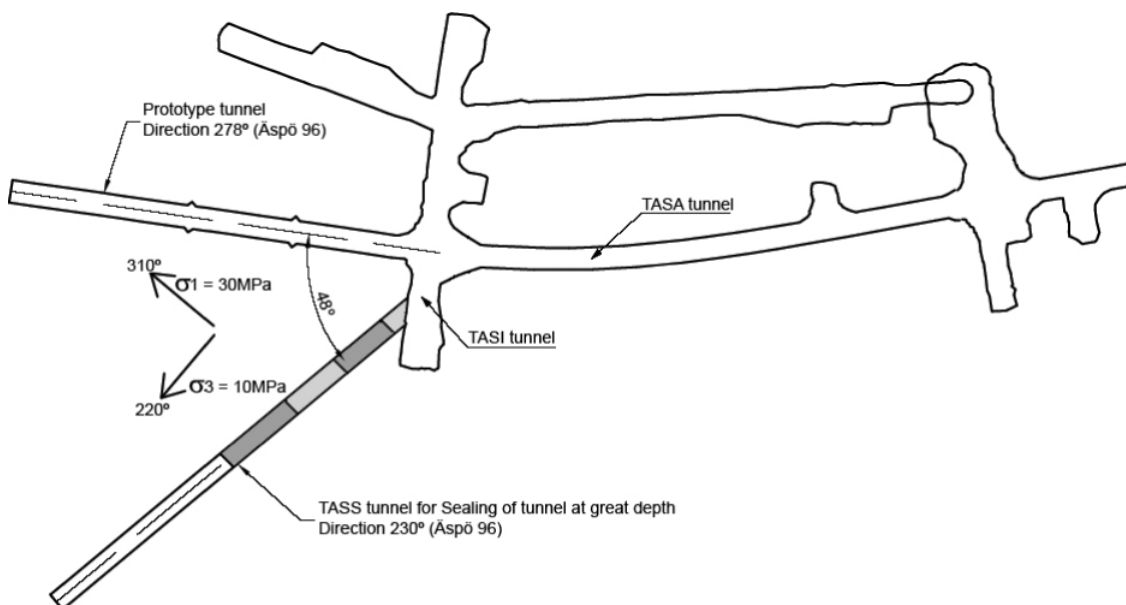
A horizontal plan of the TASS tunnel /Malmatorp et al. 2008/.
